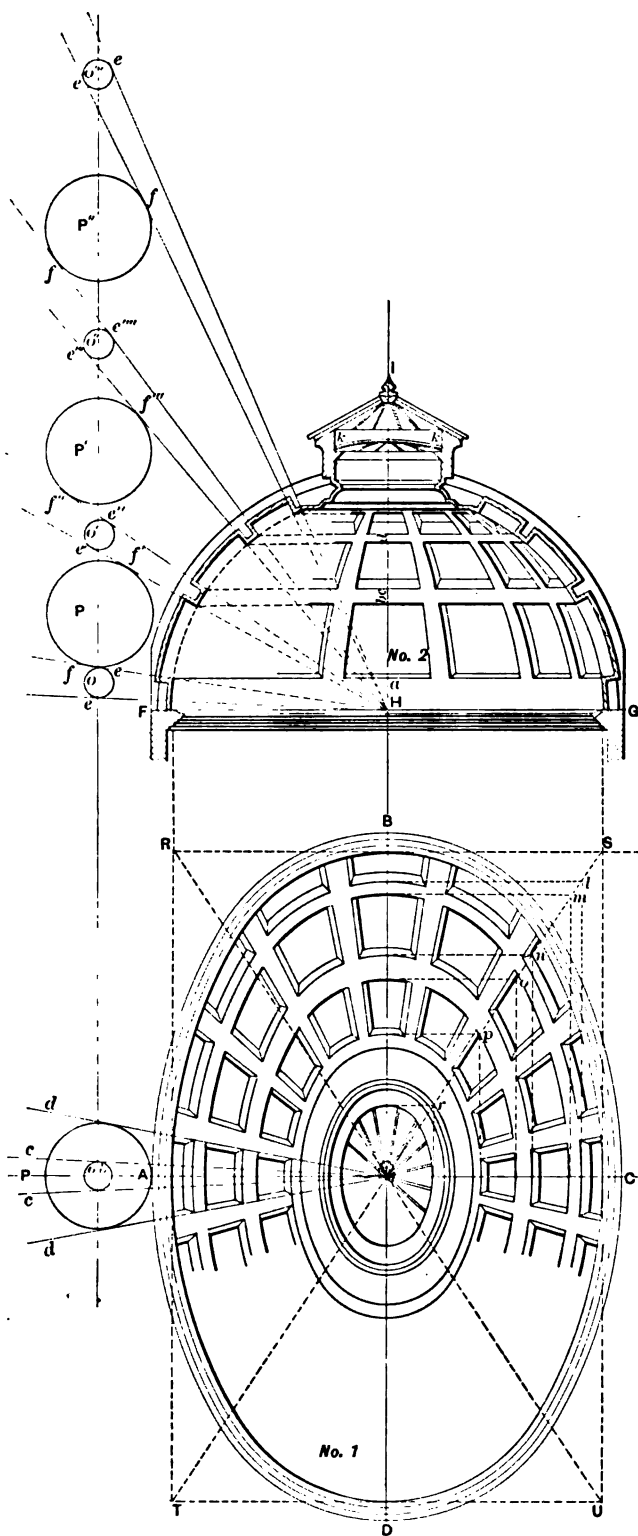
Plan and Sections of an Ellipsoidal Vault.
